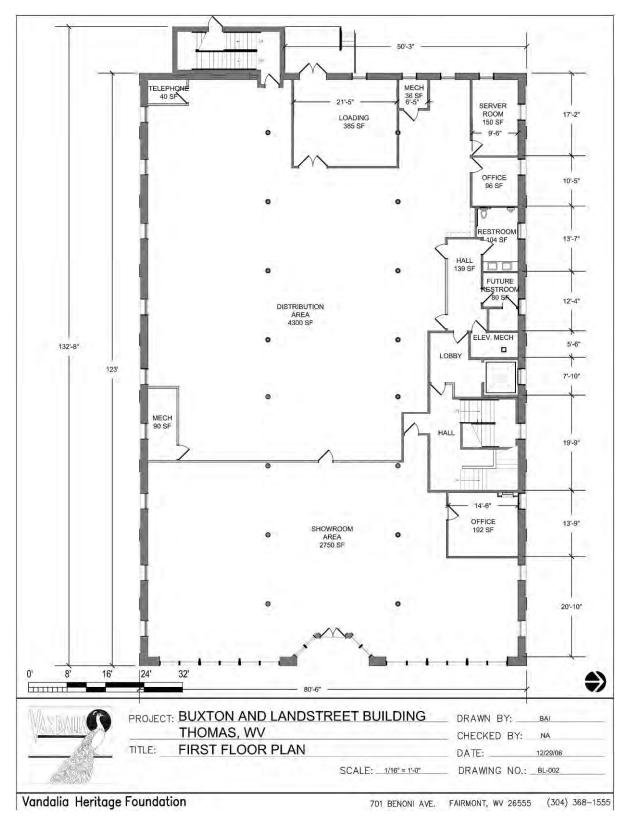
Buxton and Landstreet Company Store Floor Plan, First Floor
